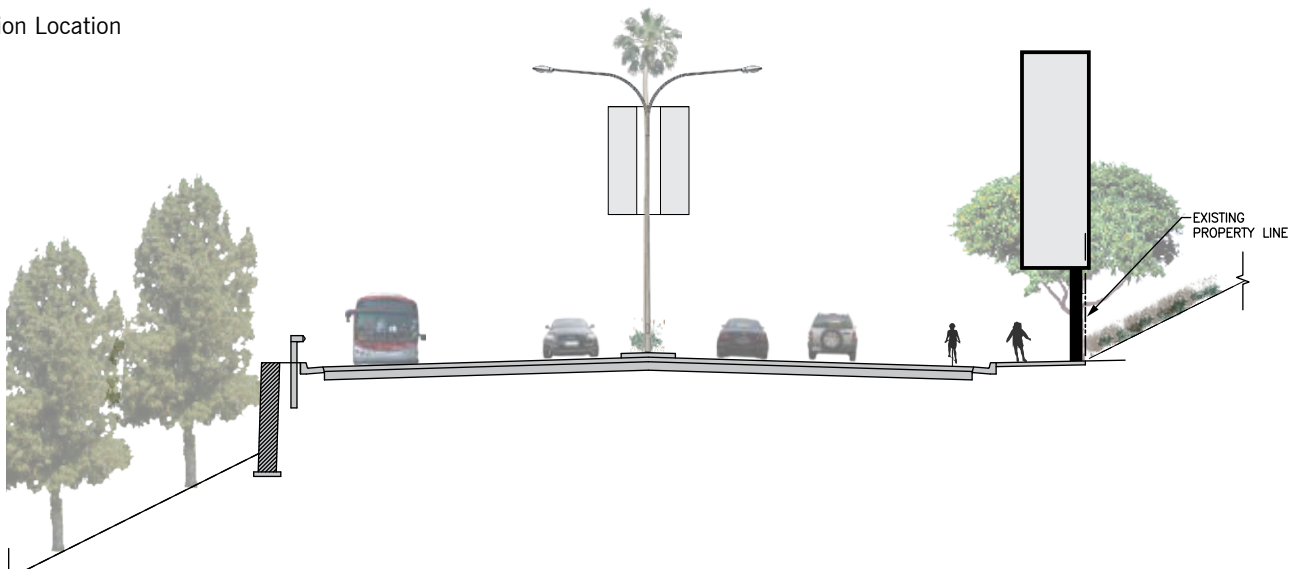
Conceptual section of Universal Hollywood Drive reconfiguration near Lankershim
